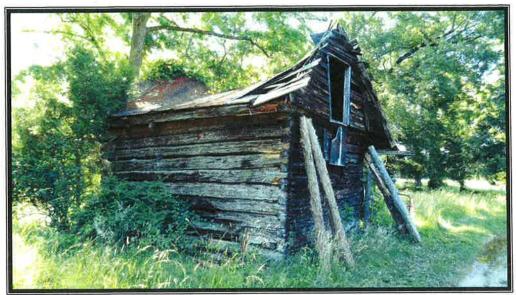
View of corncrib, rear (north) elevation and side (west) elevation, looking southeast.
